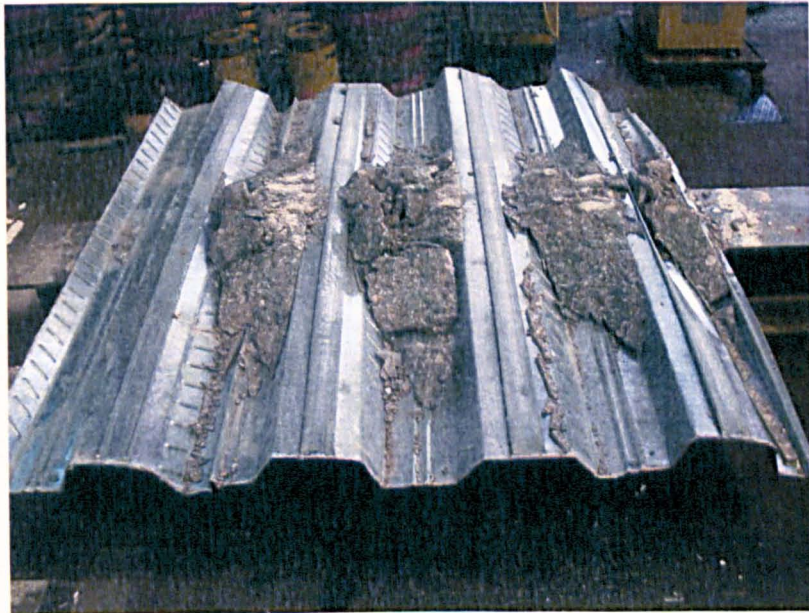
Formation of concrete failure cones in push test PTDN 2-2
